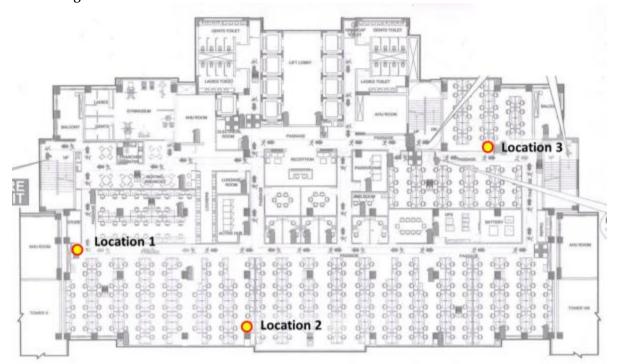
Floor plan showing monitored locations- Building 2 in New Delhi
